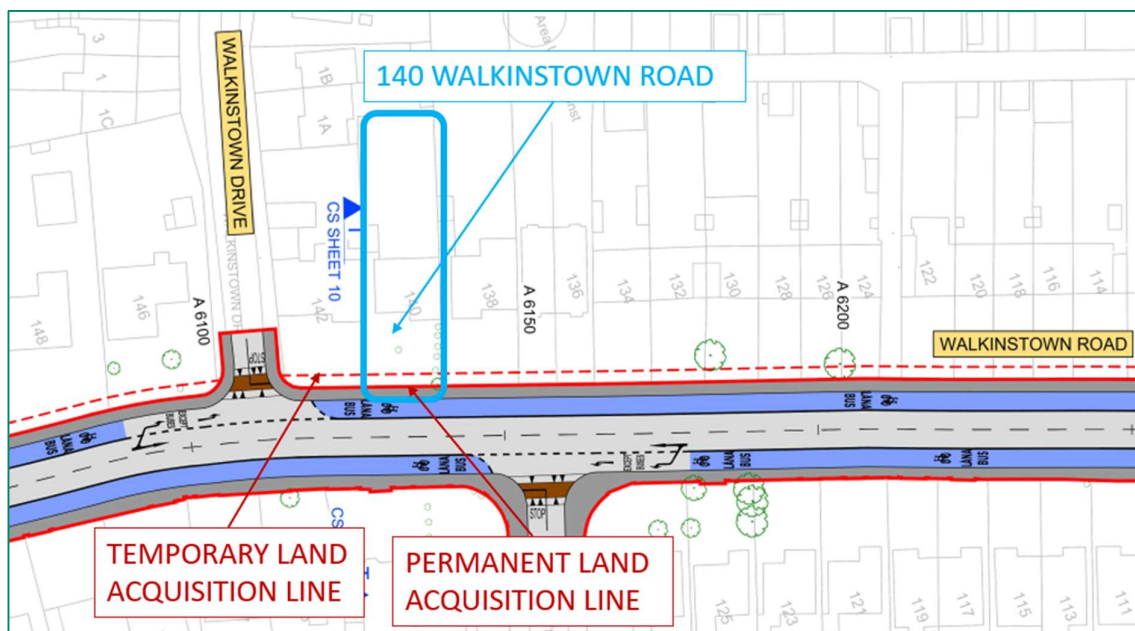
General Arrangement of Proposed Scheme adjacent to 140 Walkinstown Road (Sheet 20)
